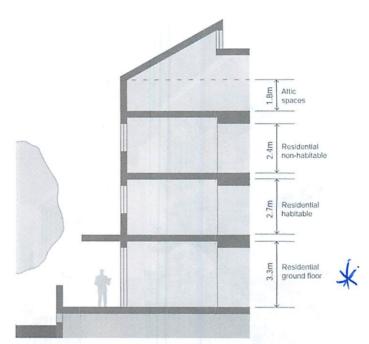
C.2 Ceiling heights of minimum 2.7m help to achieve good daylight access and natural ventilation to residential apartments
